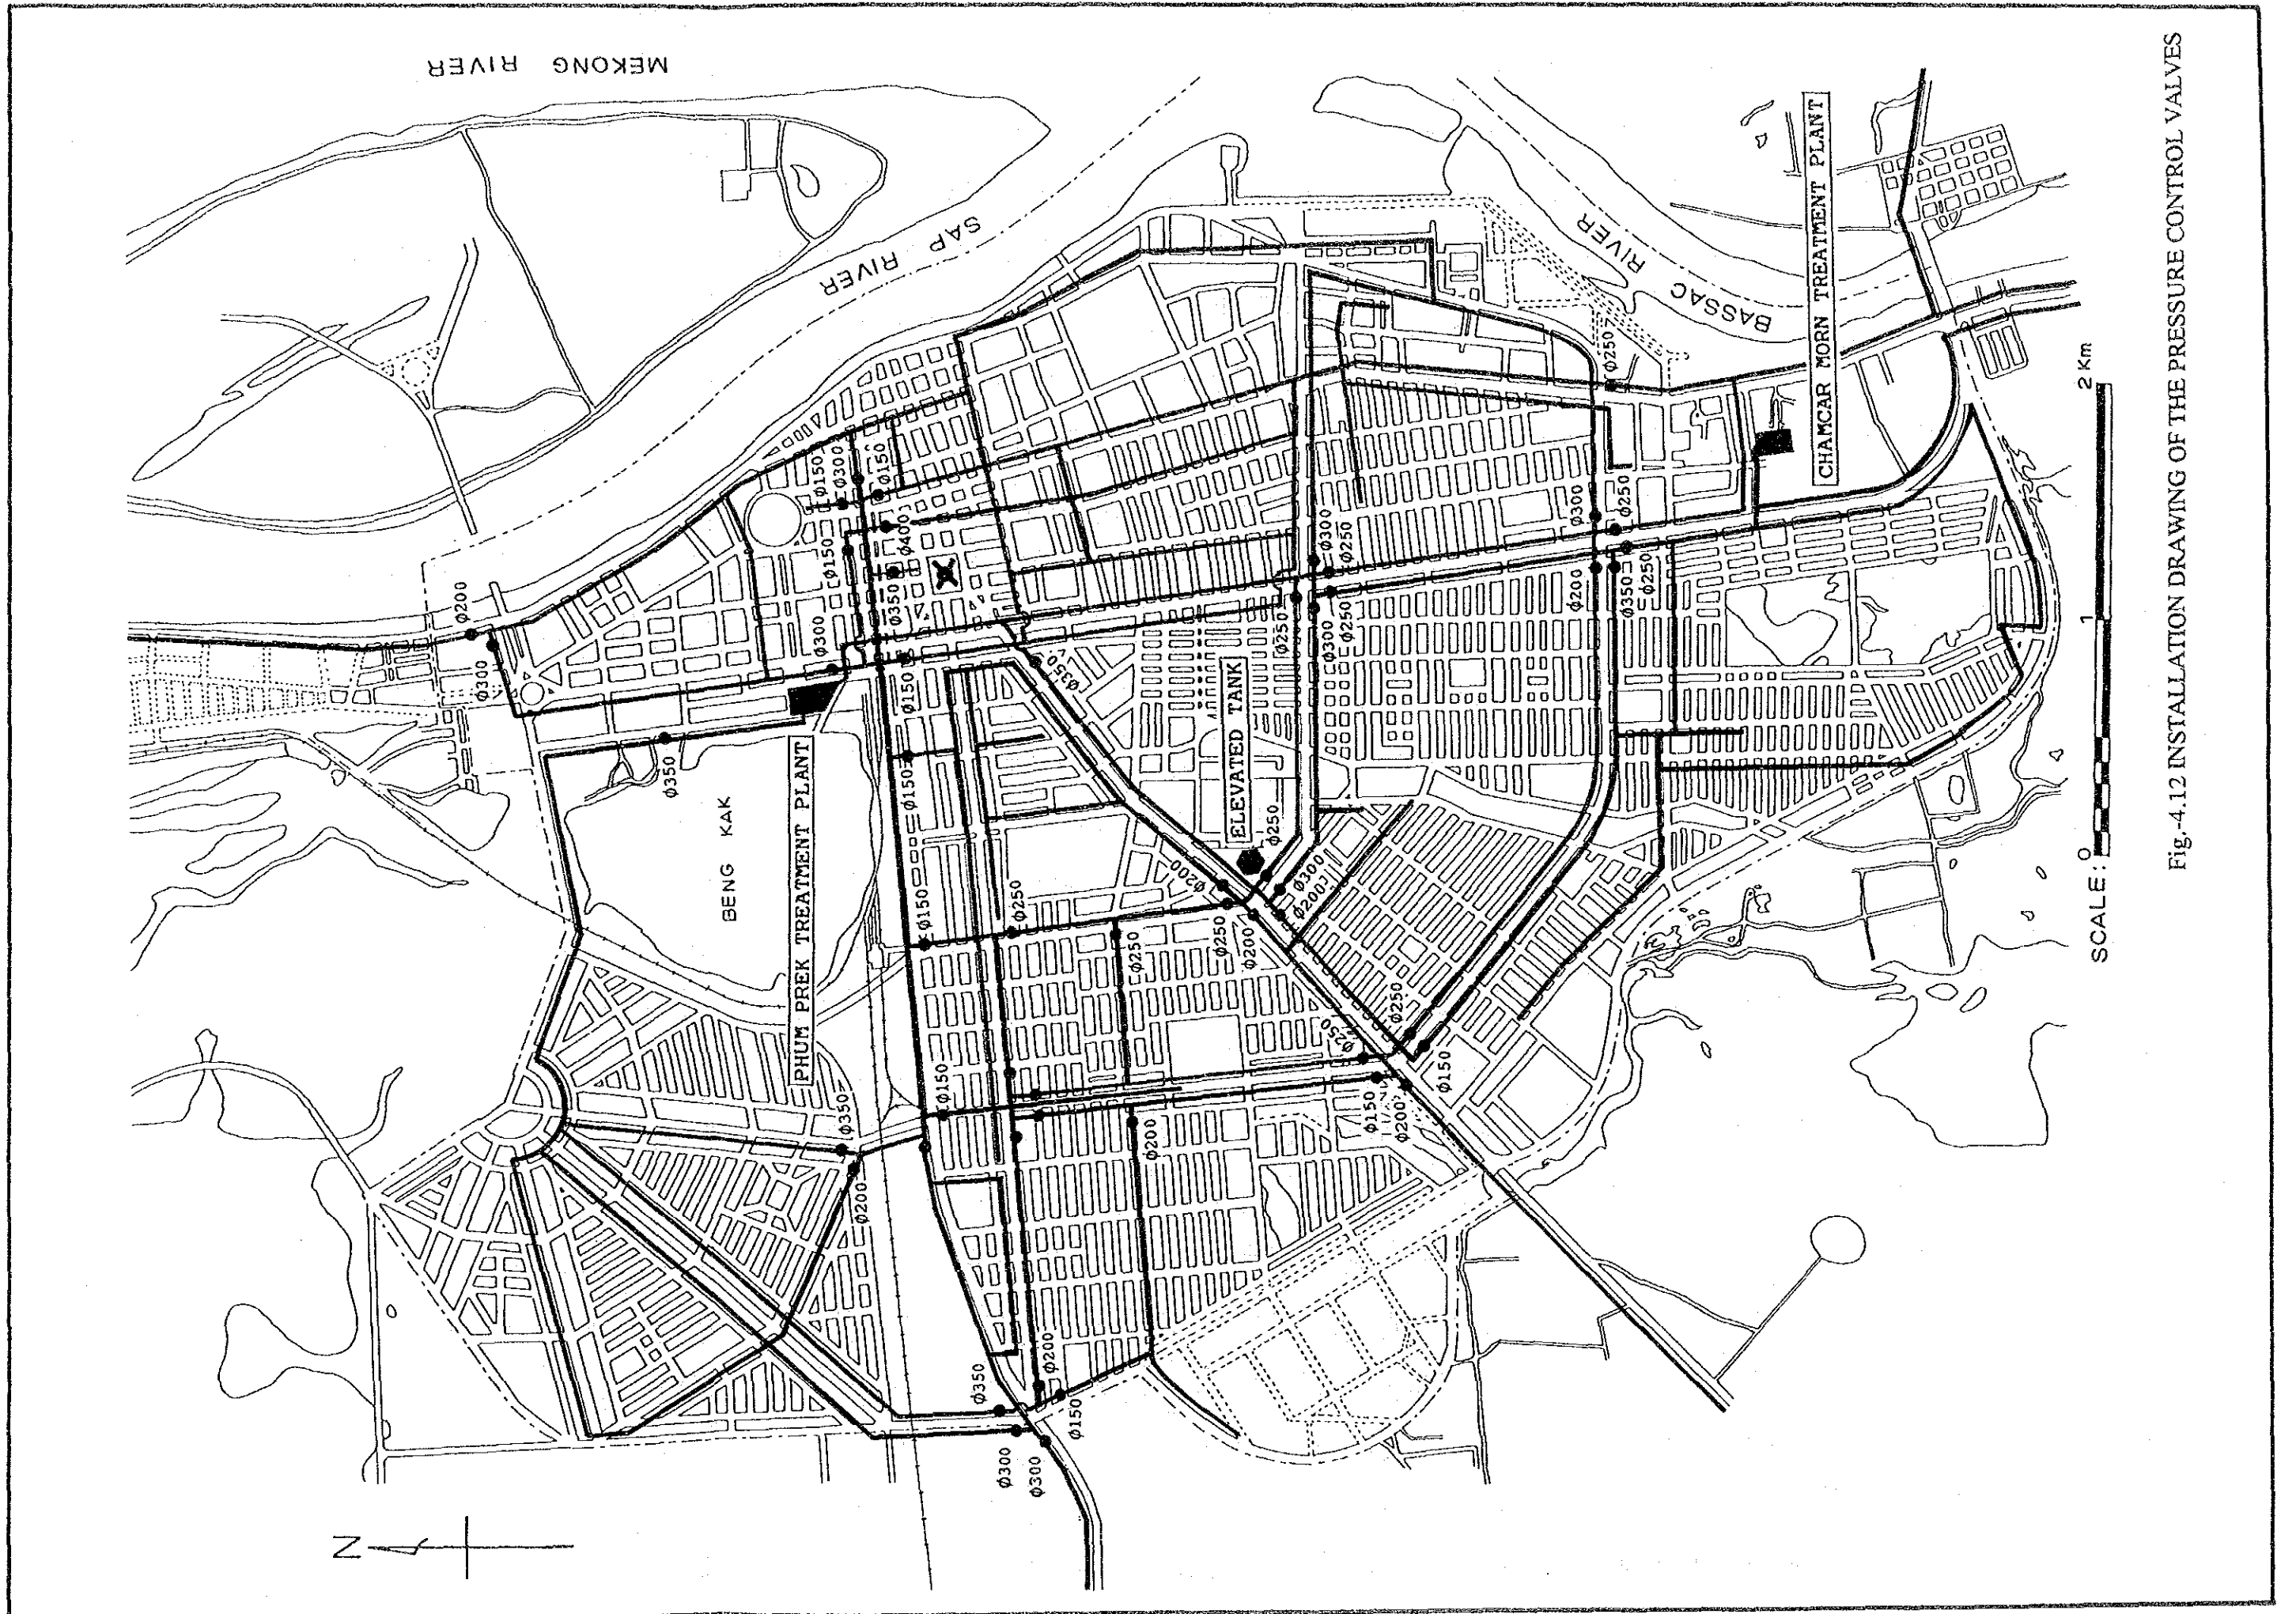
INSTALLATION DRAWING OF THE PRESSURE CONTROL VALVES
